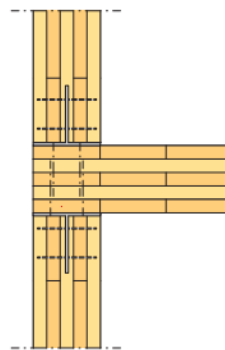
Joint between wall panels and floor slab using slotted-in steel plates.
